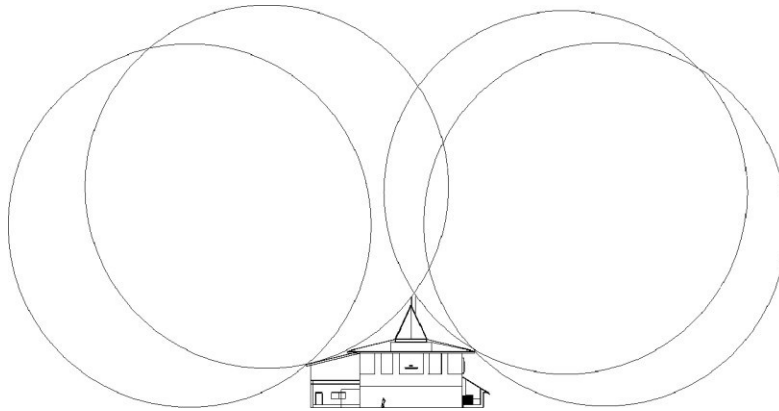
Rolling Ball Method in Building B12 Electrical Engineering FT UM (Side View)
